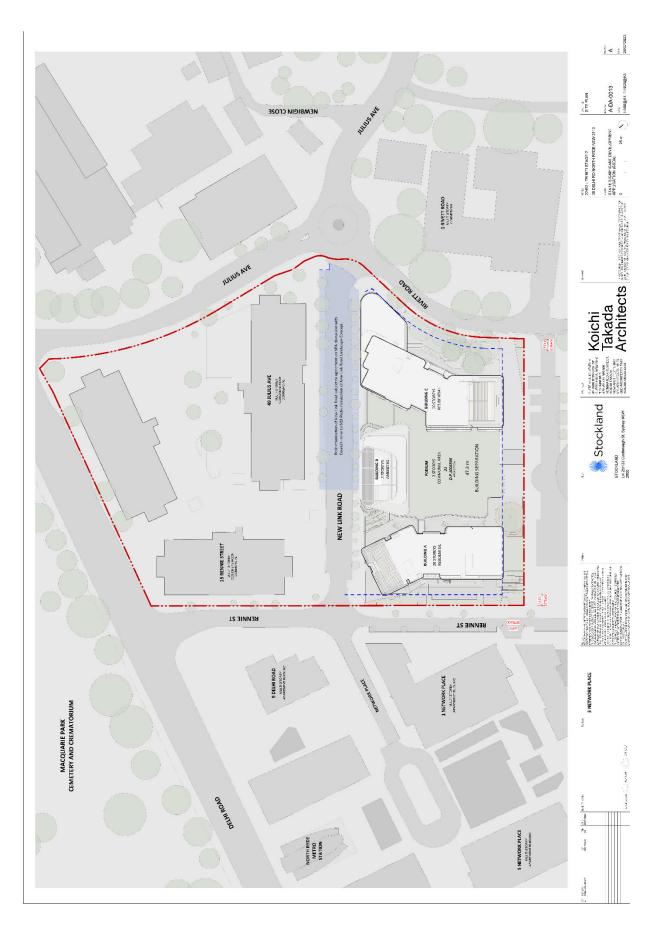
Site plan of proposed development Source: Koichi Takada Architects
